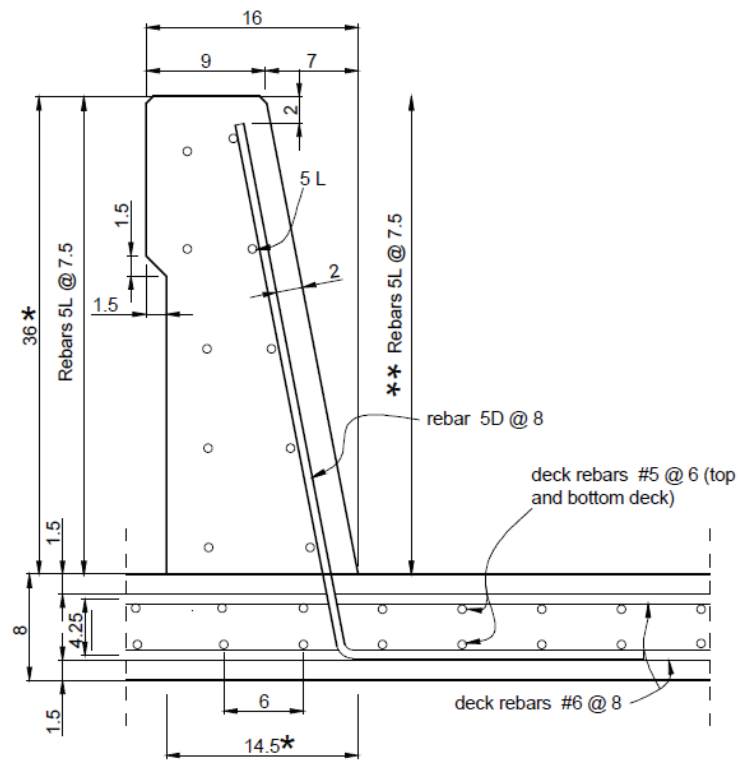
Pendulum specimen single slope 36" section A-A, all measurements in inches
